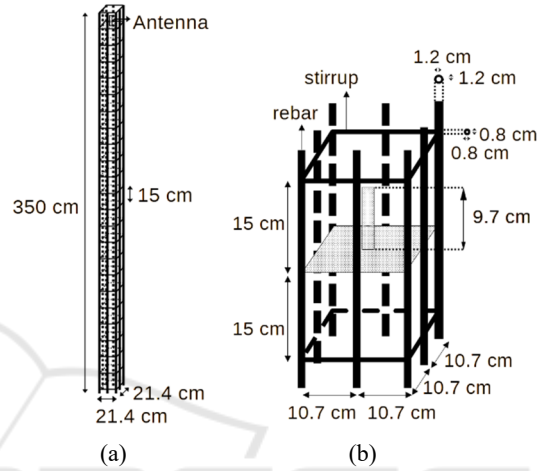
Structural Design: (a) Concrete Column Structure, (b) Embedded Antenna within Rebar Structure.
